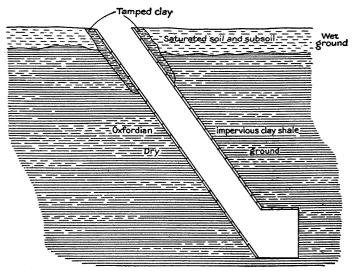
Section in Woevre lowlands, Lorraine, showing underground conditions and entrance to cave shelter.
